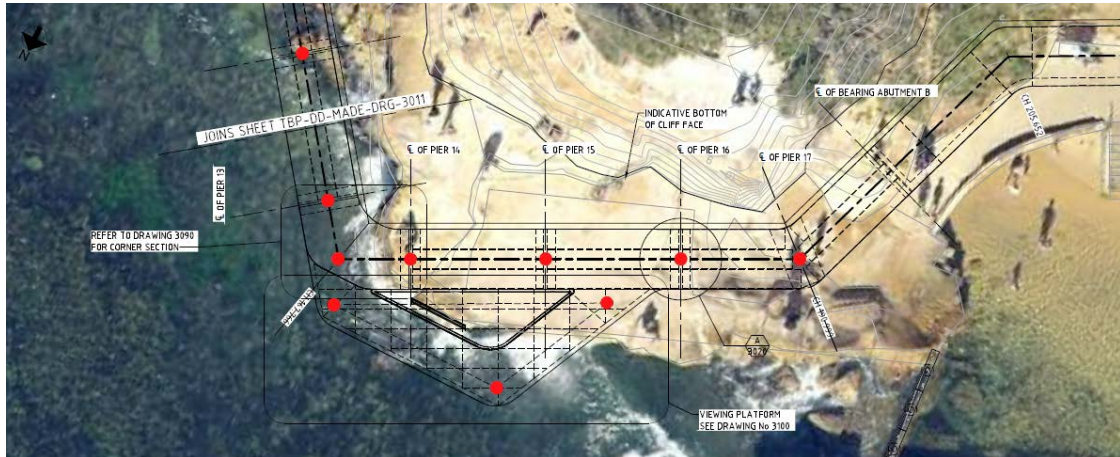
image from Attachment 2 Terrigal Boardwalk and Rock pool design drawings (drawing number TBP-DD-MADE-DRG-3012), proposed pier locations on the sandstone rock are highlighted in red.
